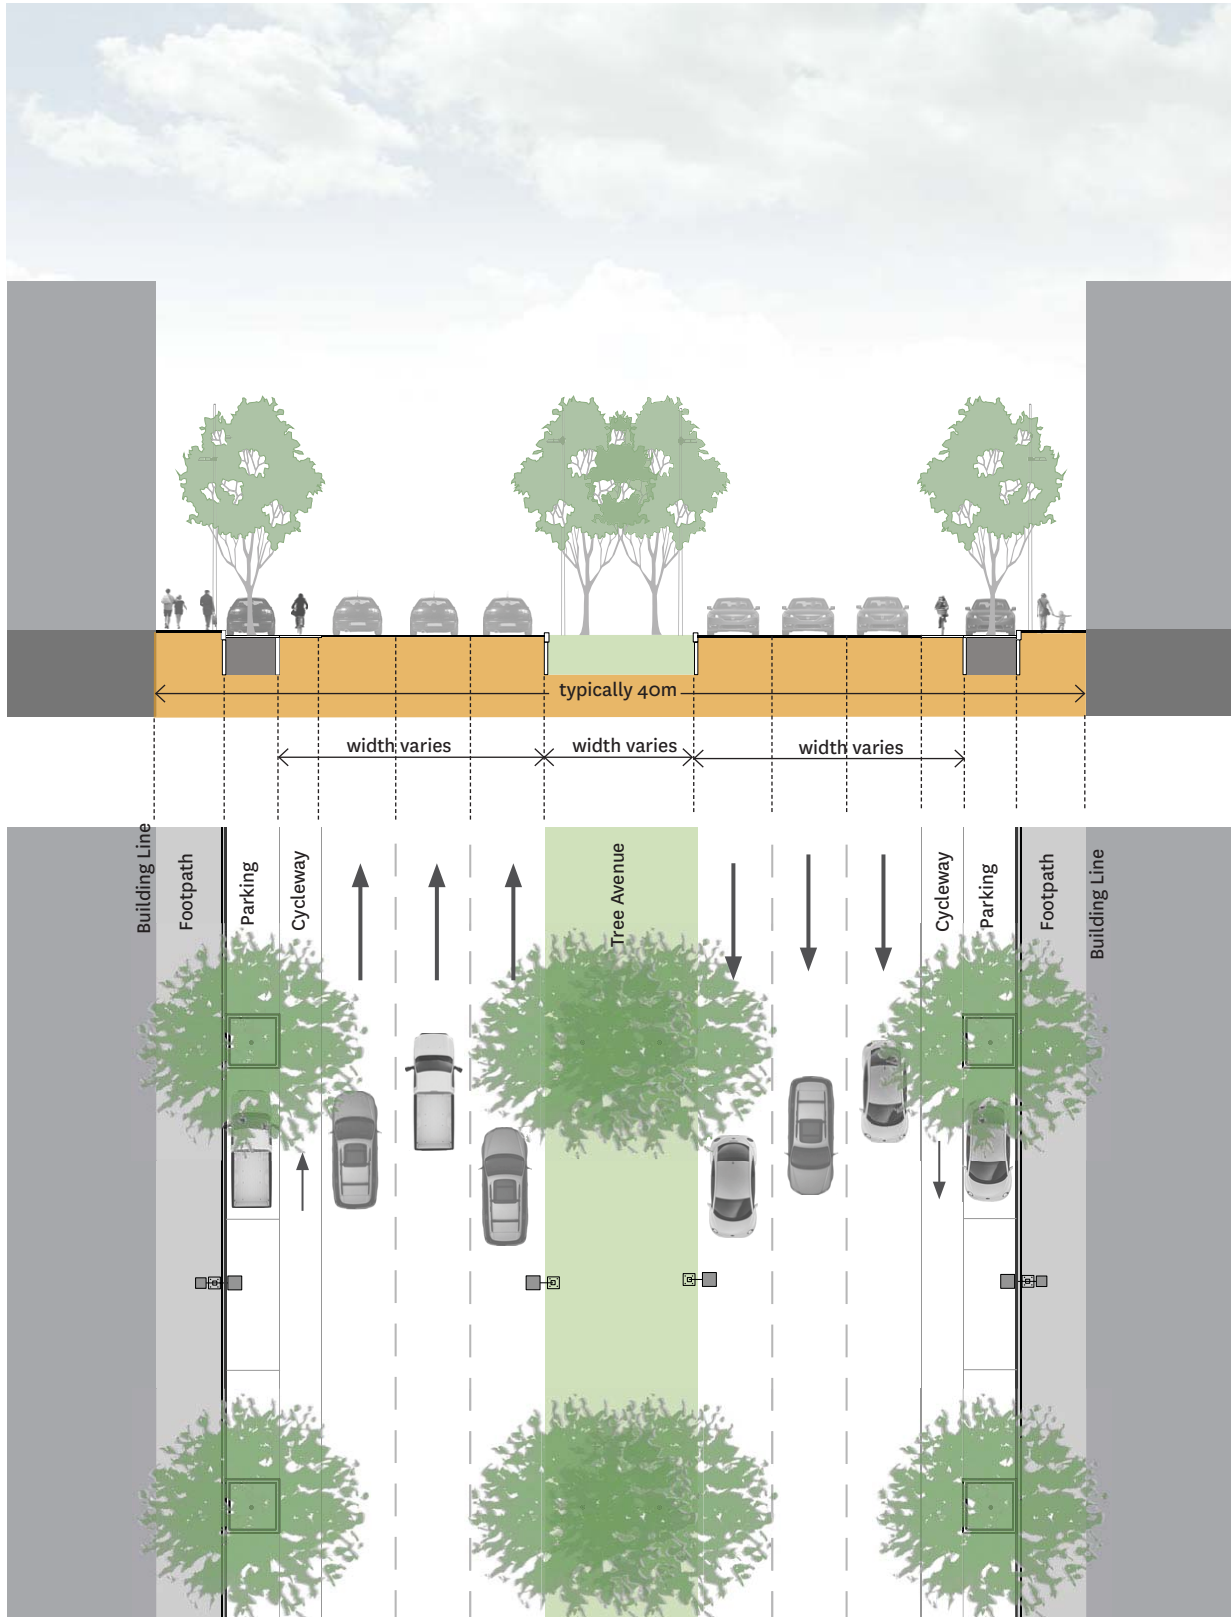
Moorhouse, Bealey and Fitzgerald avenues - typical existing cross-section
